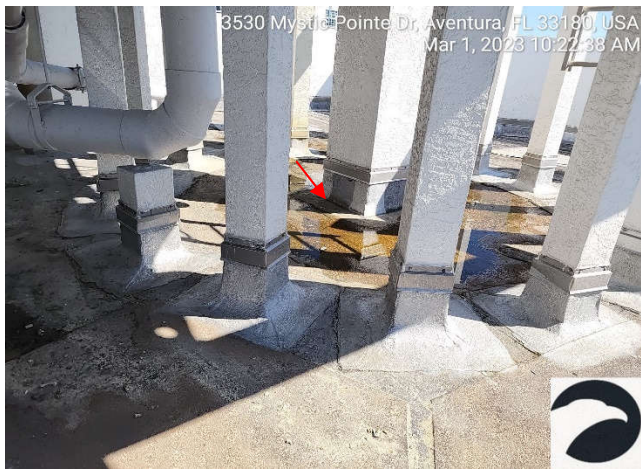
Ponding water at the cooling tower and columns from the previous cooling tower structures (Main Roof)
